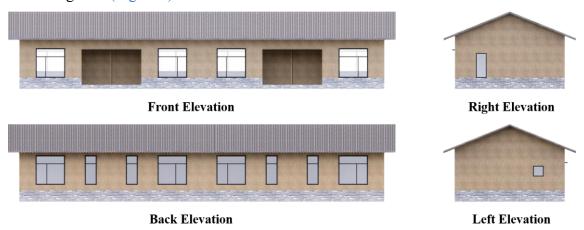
Four Elevations of Sample Guest Room No. 2 (Drawn by the author)
